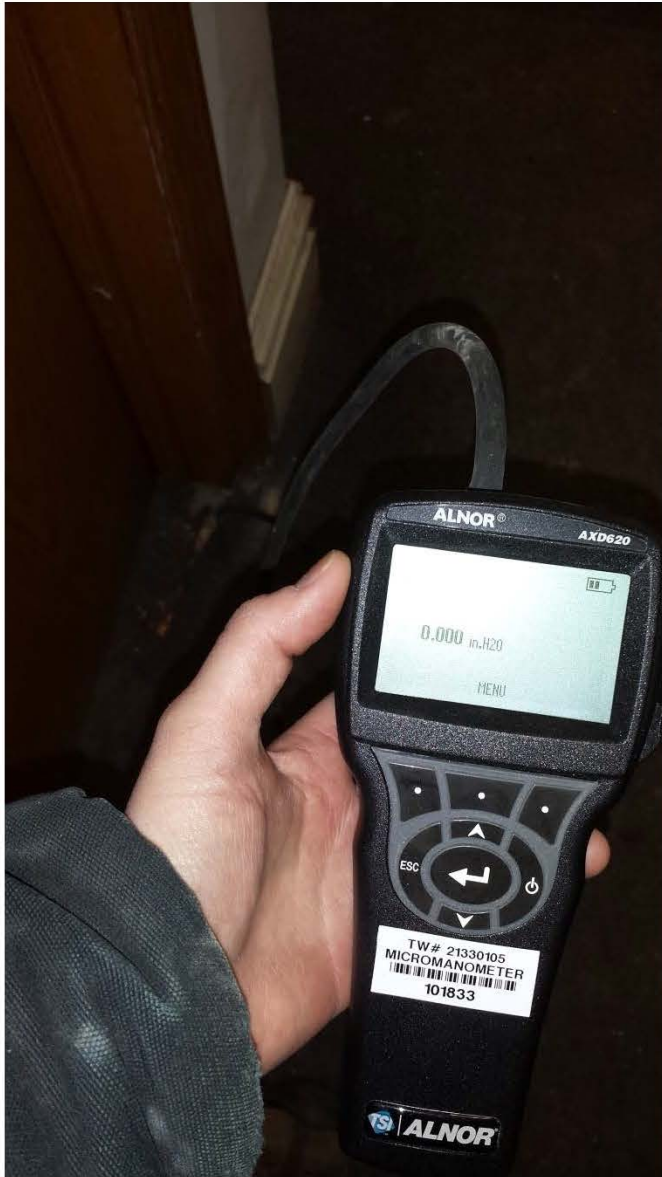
View of final mitigation system test point readings: TP-09 reading.
